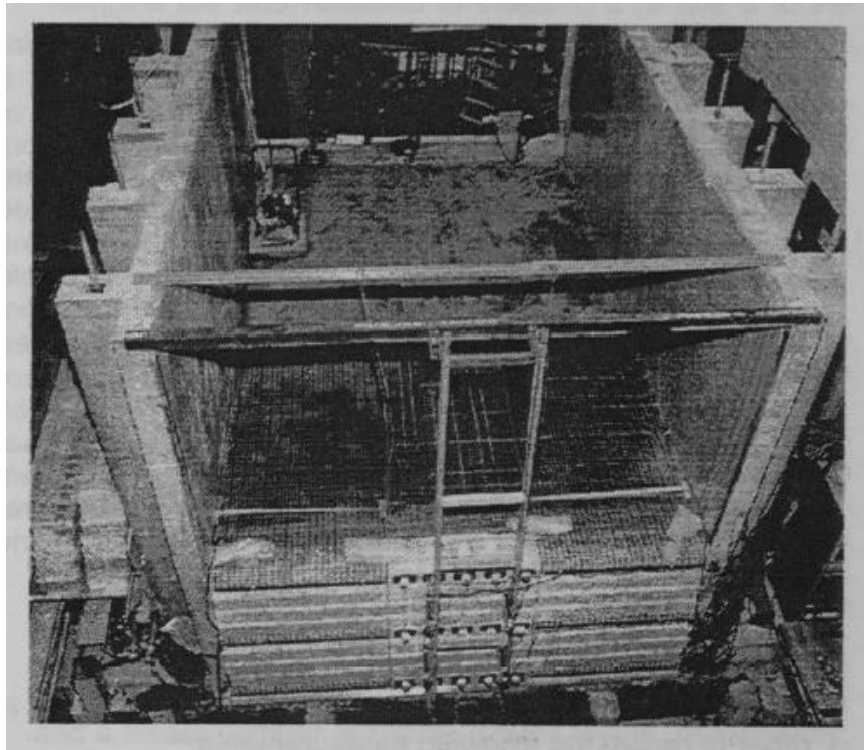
Geosynthetic reinforced retaining wall at RMCC.
